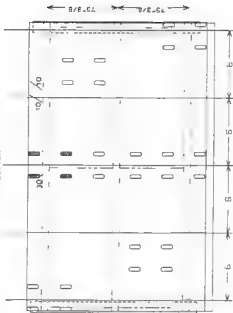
Bottom Cracking Pattern (Fourth Bridge - Test No 2)
